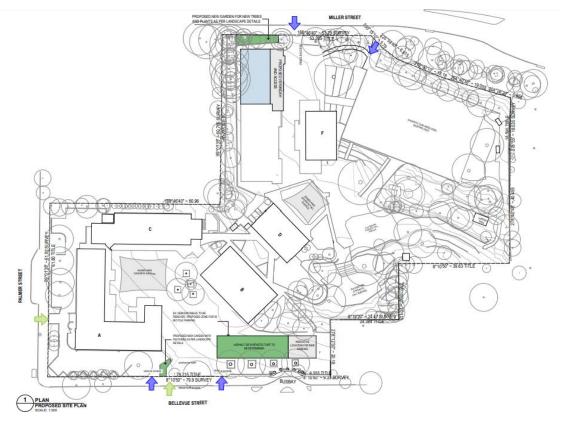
Proposed Scope of Works (Source: Fulton Trotter Architects, Proposed Site Plan (Rev 6)
